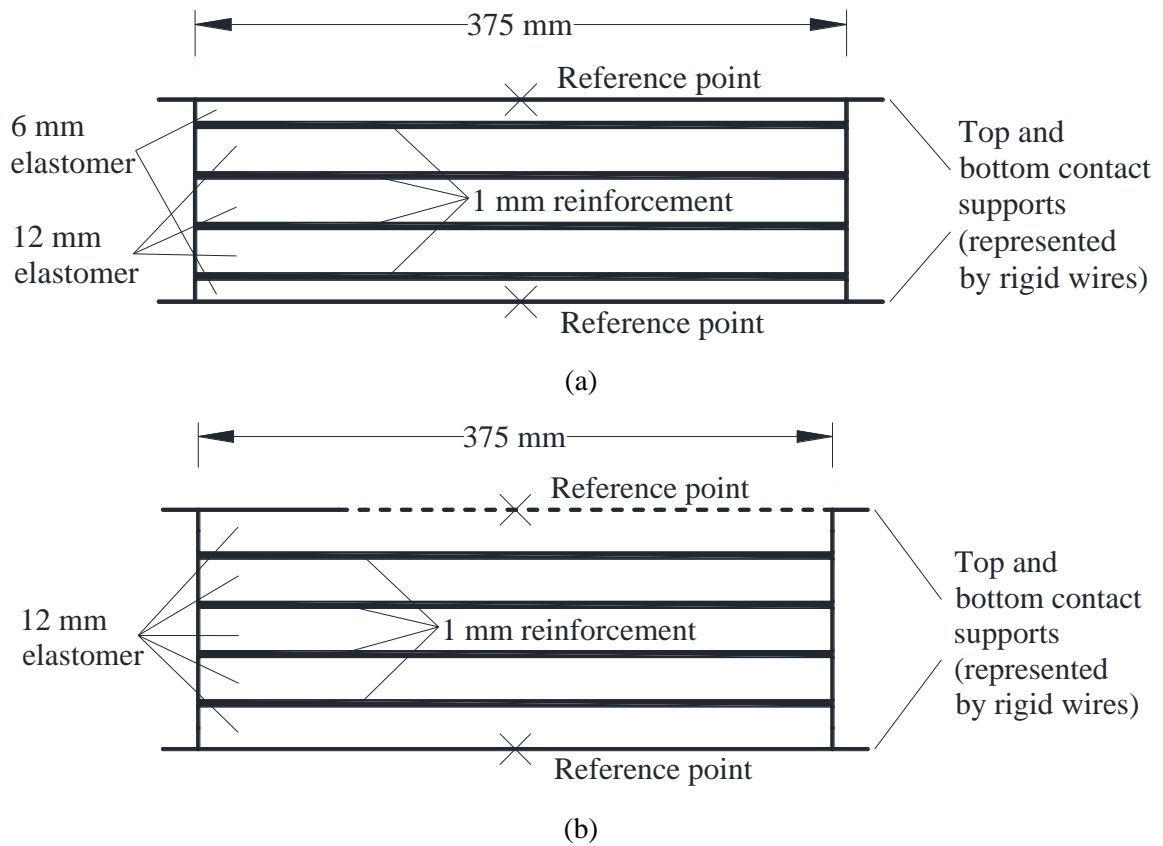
Sketch of Bearing (a) B2; (b) U2.
